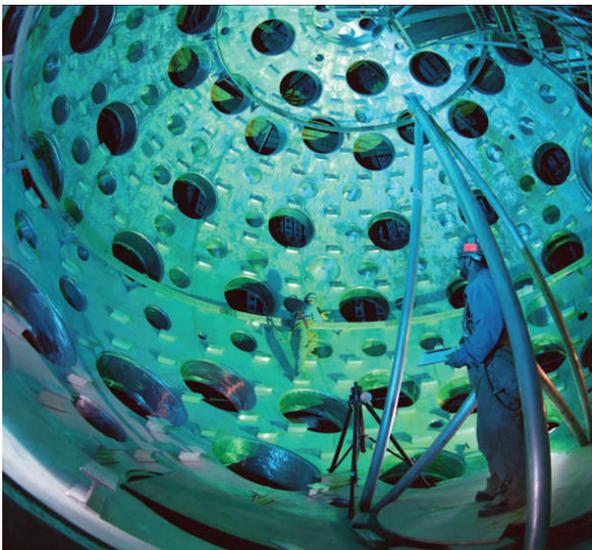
The NIF target chamber is constructed from 4-inch-thick aluminum and coated with a 16-inch-thick shielding concrete shell. The entire assembly weighs about one million pounds.
